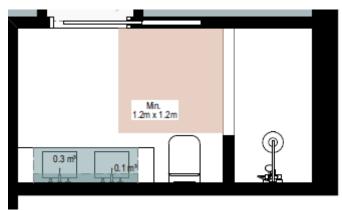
Excerpt of the accessible bathroom from apartment Type 3 – Decision Plans
